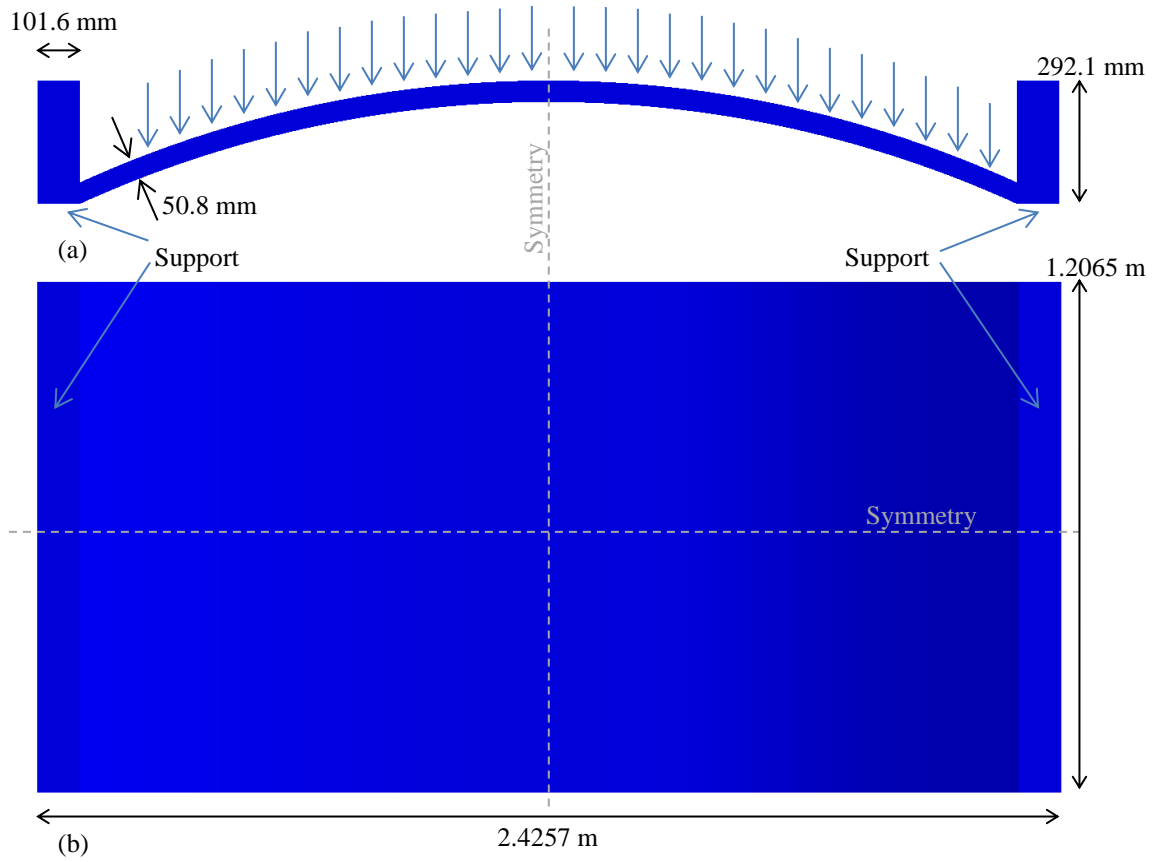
Blast arch panel schematic (a) side view (b) plan view
